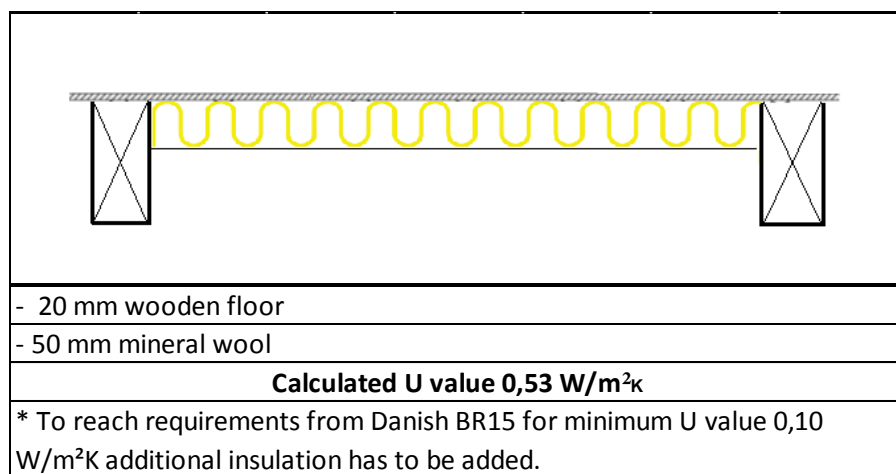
Floor between ground floor and crawl basement in 1960-1976.
